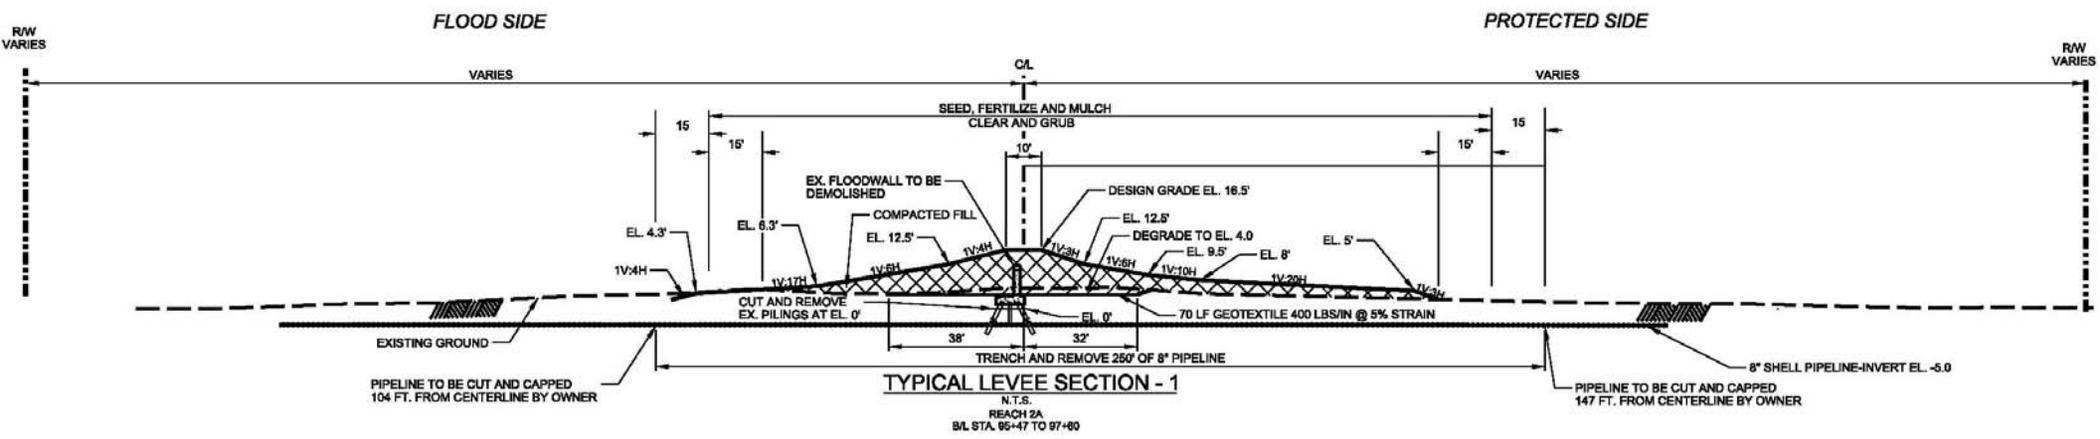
Cross-sectional view showing the existing Shell Pipeline floodwall and earthen levee segment proposed to replace it.
